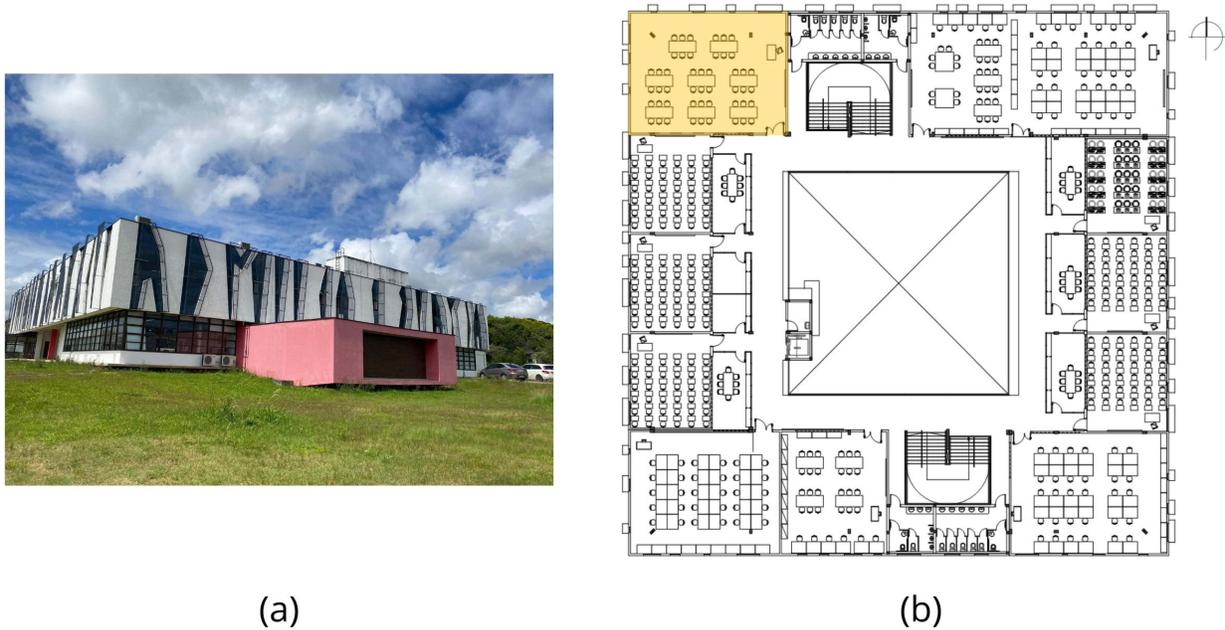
(a) Architecture and Urbanism building at the Federal University of Santa Maria (UFSM). External view (left) and (b) second-floor plan (right) with the analyzed classroom highlighted.
